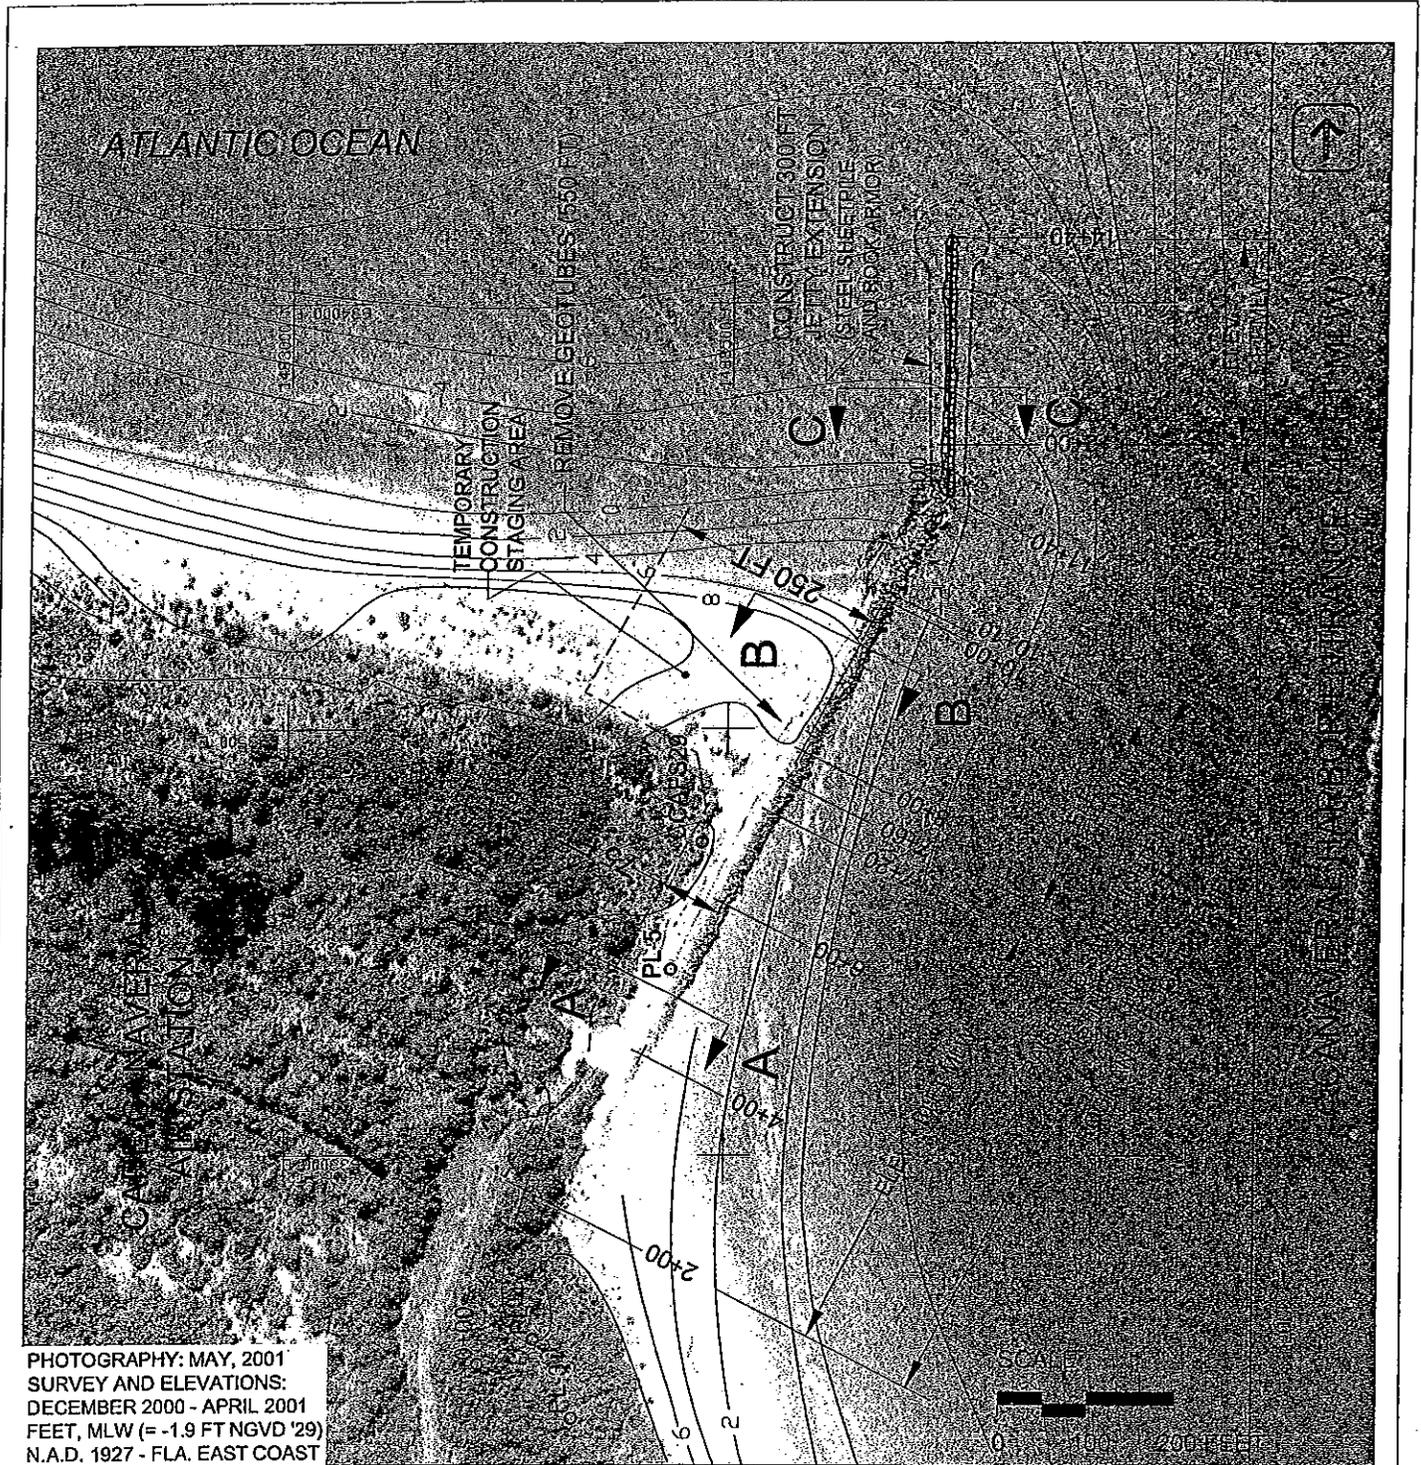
PLAN OF IMPROVEMENT, NORTH JETTY PERMANENT SAND-TIGHTENING AND EXTENSION
